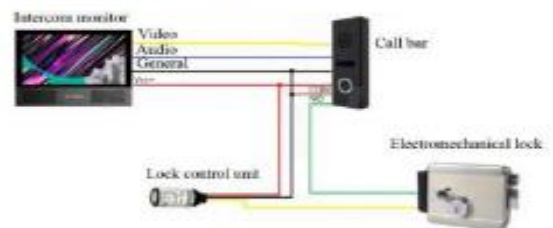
Connecting electromechanical lock to intercom for remote opening of door using LCU
